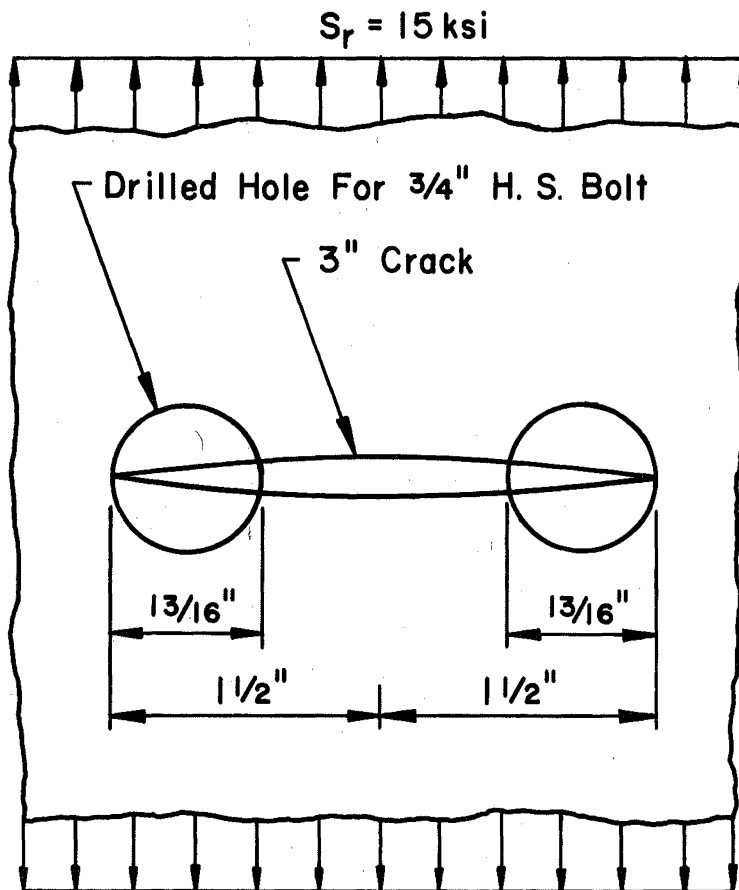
Fatigue Crack Repair by Drilling Holes at Ends of Fatigue Crack and Bolting
